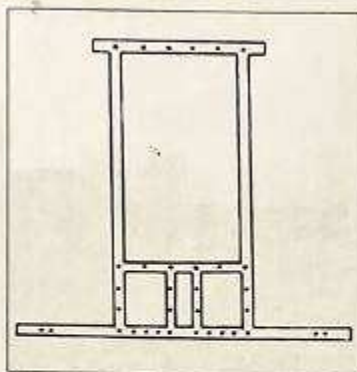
Telford's wire bridge model 1814—sketch of cross-section at tower (Roland Paxton)
